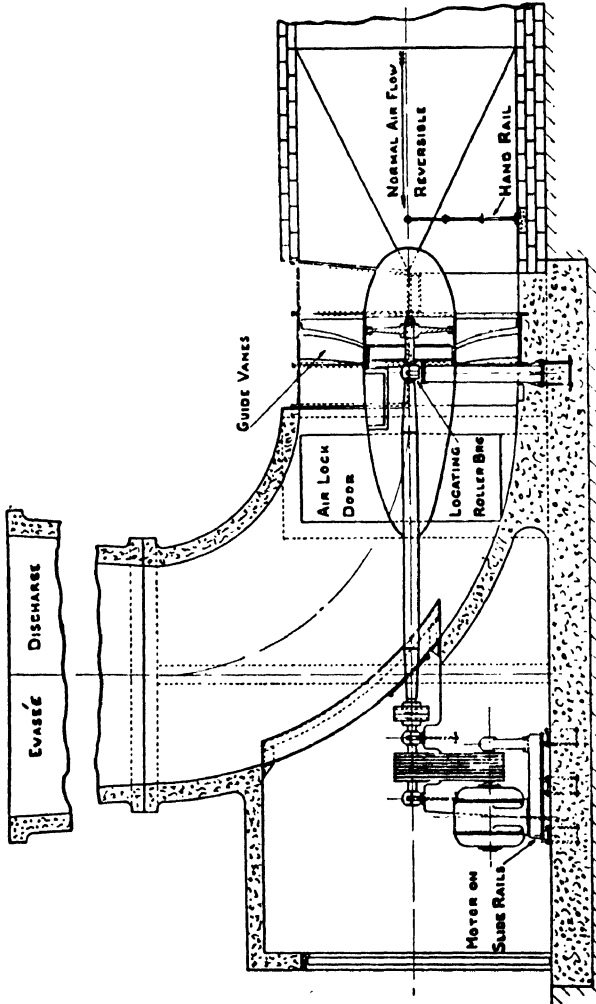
Sirocco Aerofoil Single-stage Ventilating Fan.
